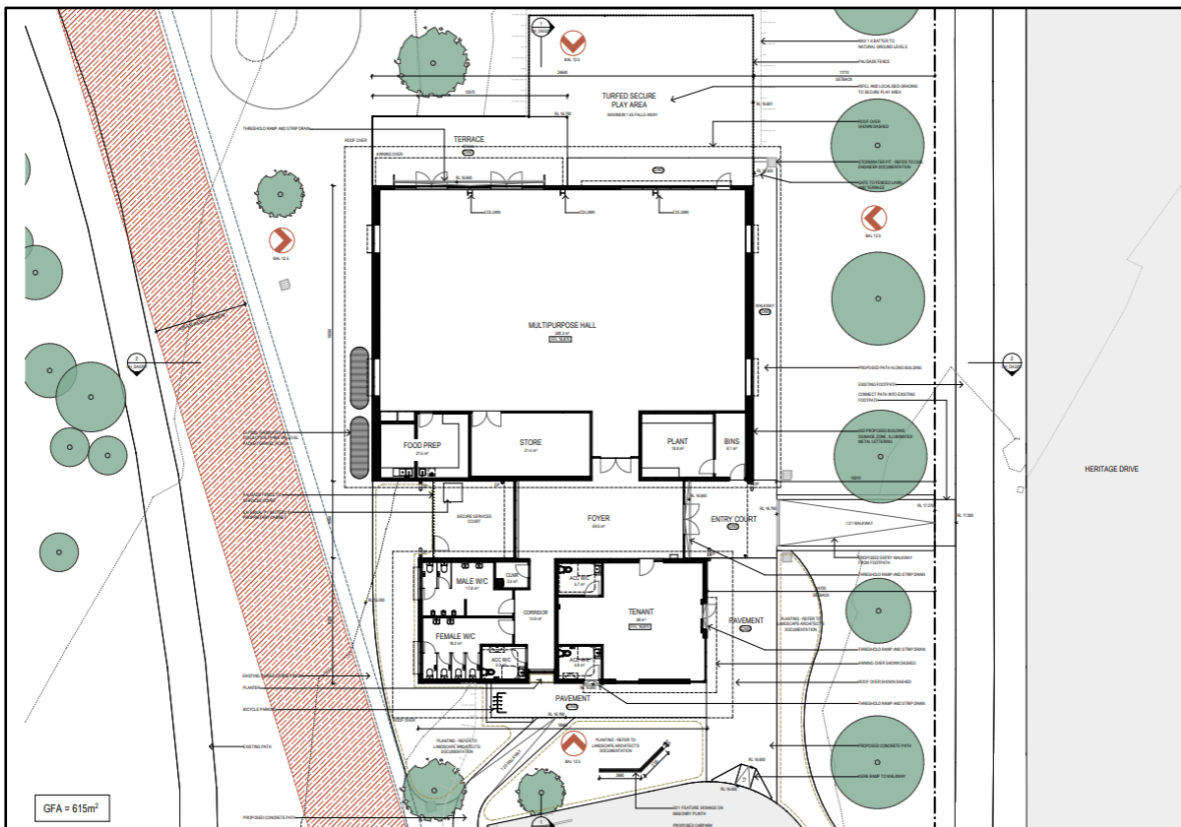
Proposed Ground Floor Plan. Source: AJC Architects dated 23 April 2024
